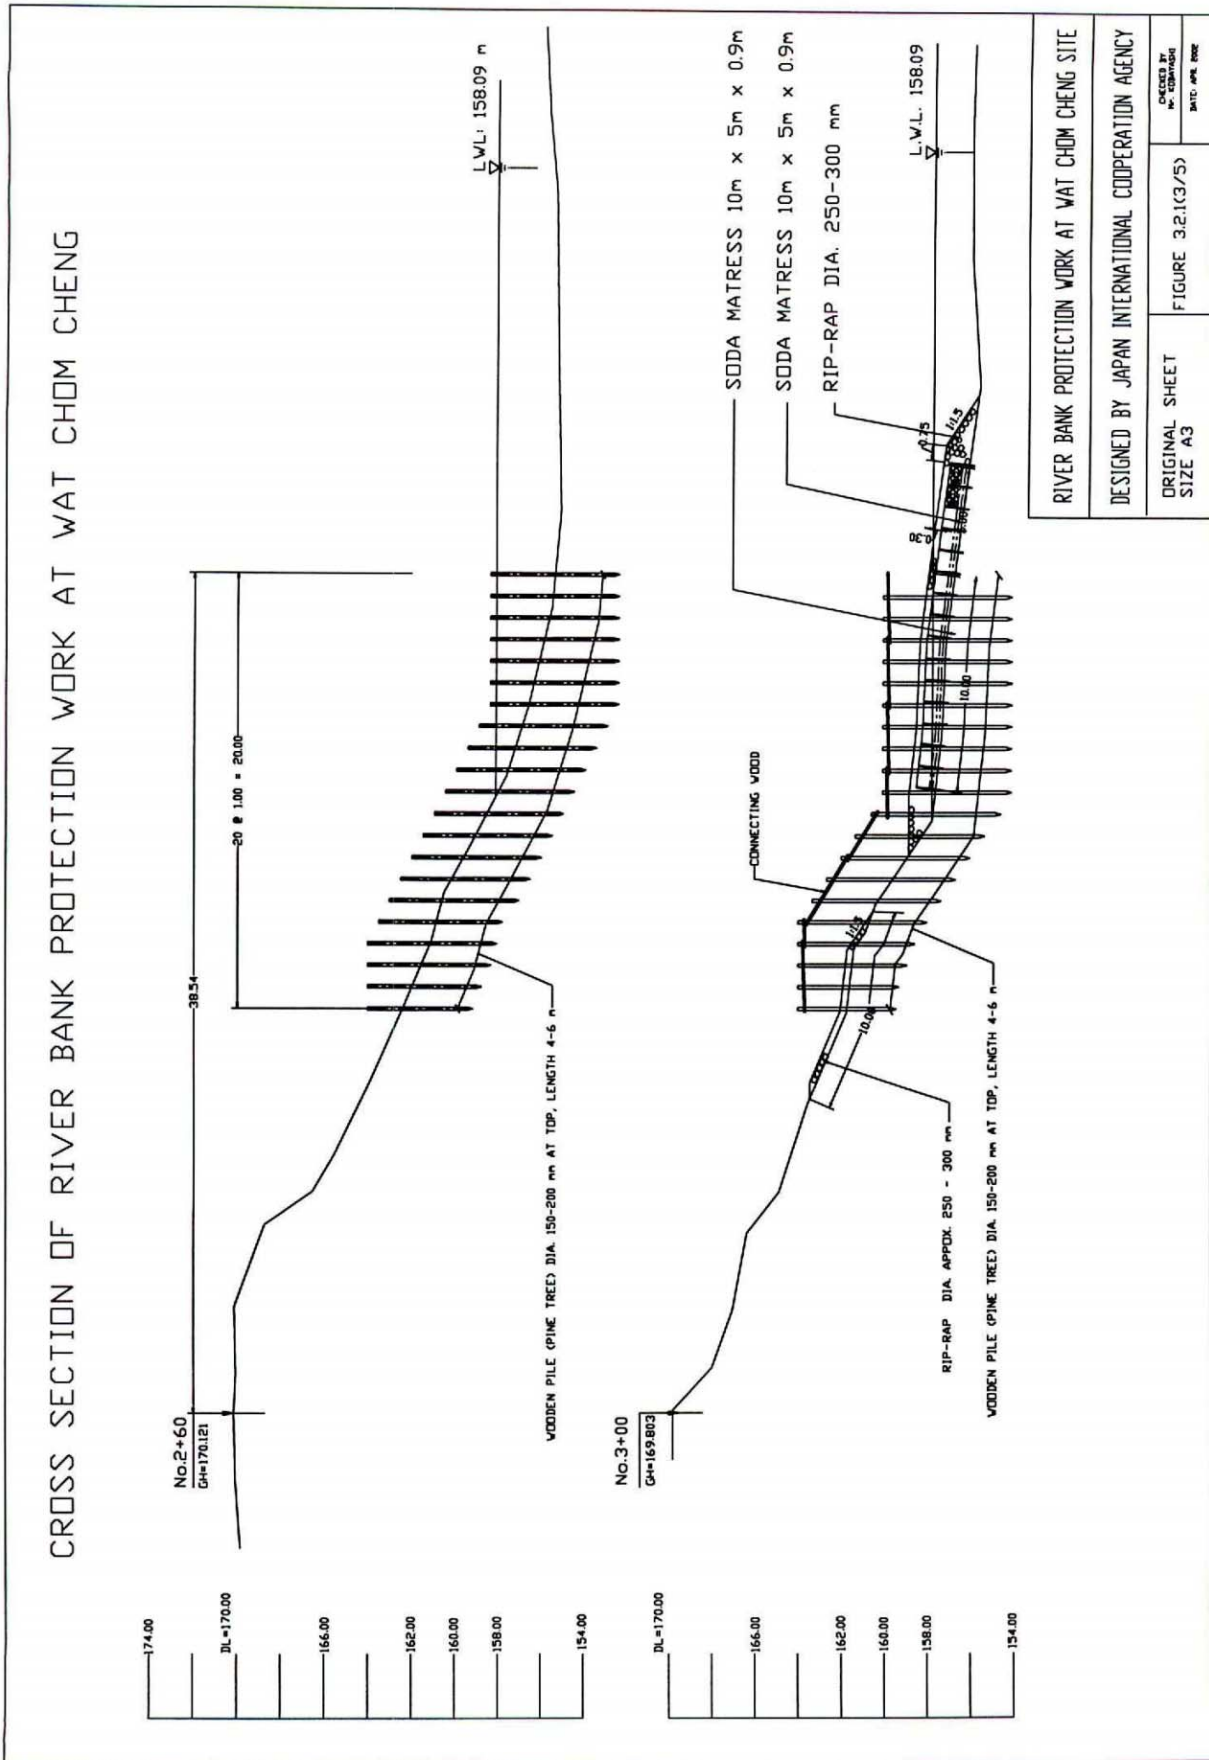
(2/3) Cross Section of River Bank Protection Work at Wat Chom Cheng Site
